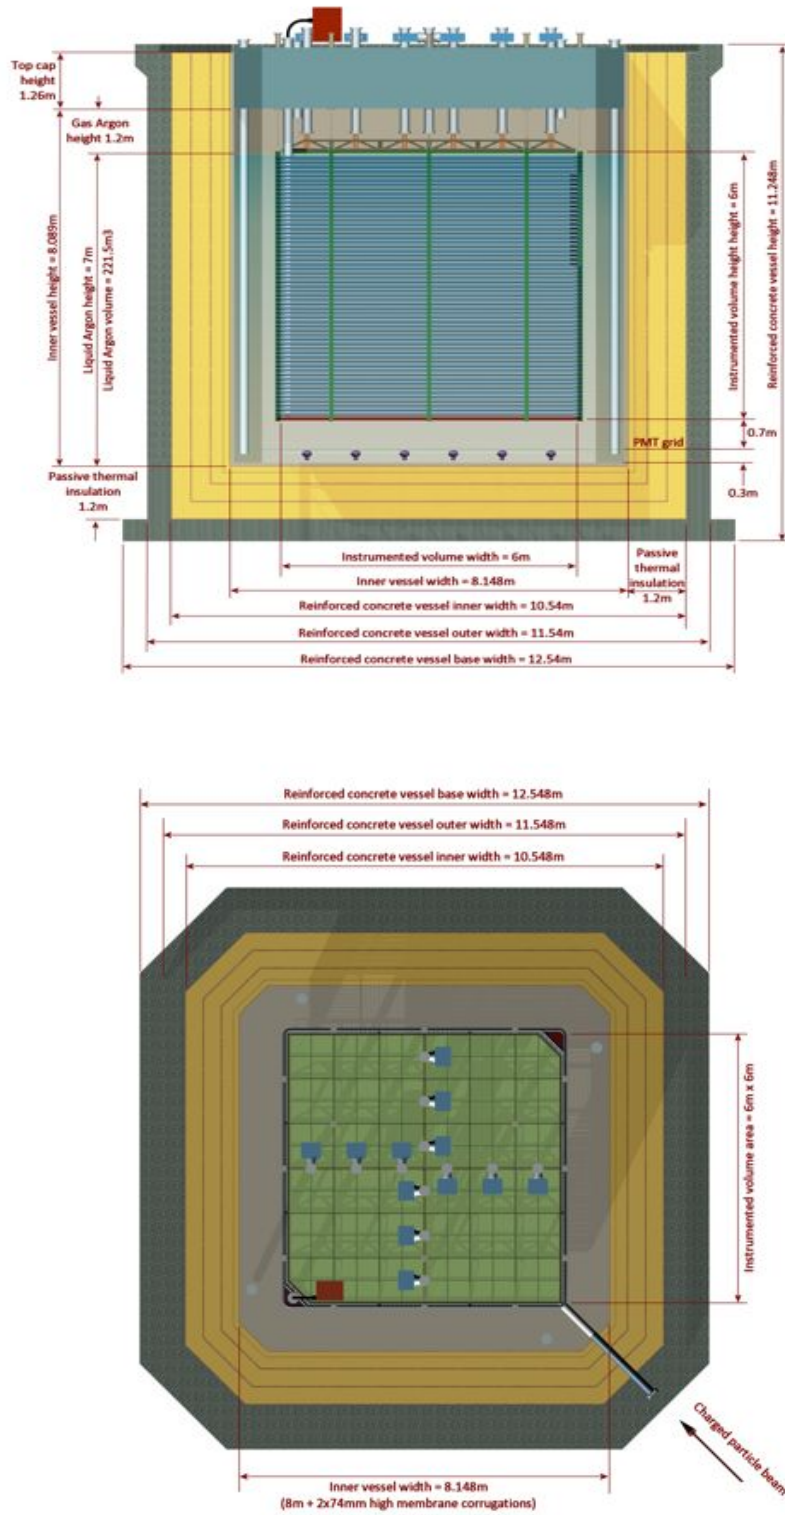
Top : plan view section of the 6 × 6 × 6 m³. Bottom : vertical cross section of the 6 × 6 × 6 m³.
